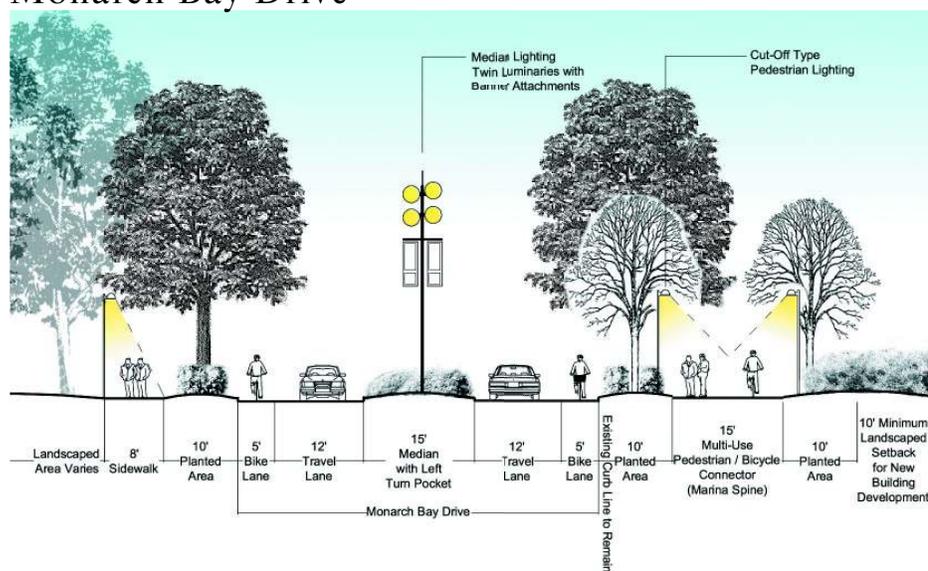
Monarch Bay Drive - prototypical cross section, looking south
